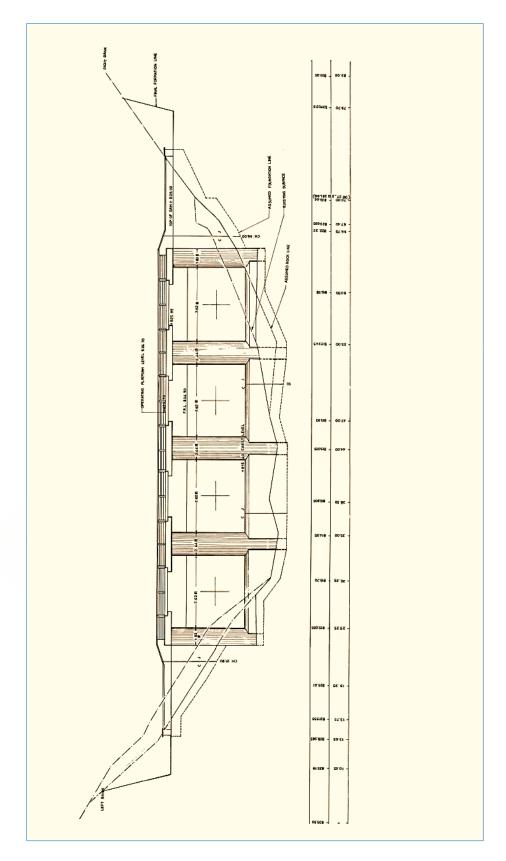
Upstream Elevation of the spillway at Kallar dam
